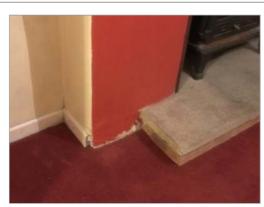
Low level blown plaster noted to dining room chimney breast.m
